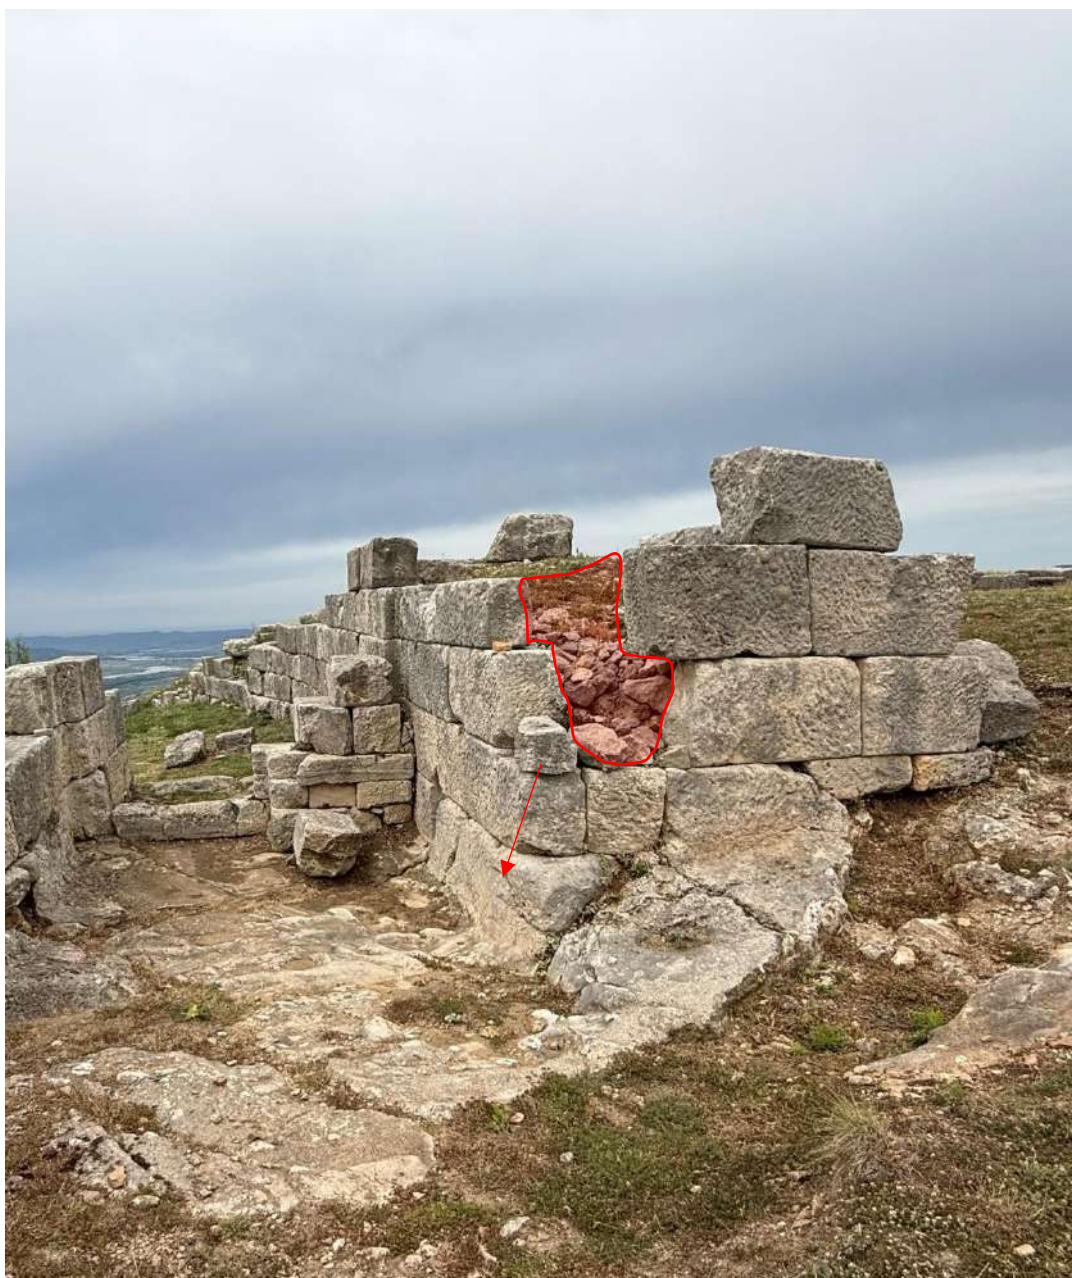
Wall crest deformations and structural failures; ineffective stabilization with improper infill (pottery fragments).
